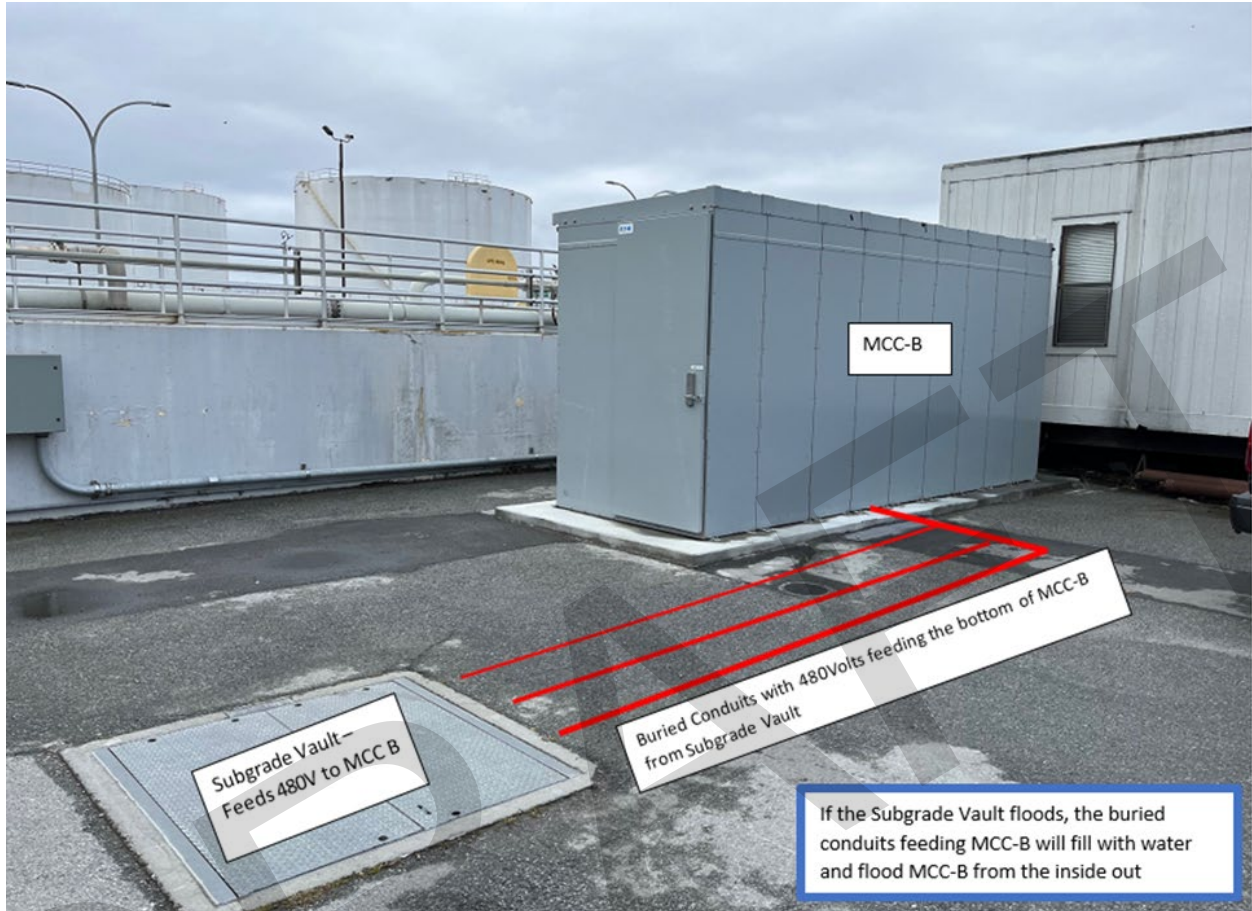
Photo of one of the eleven Motor Control Centers (MCC) at the SSF - SB WQCP, which each have buried conduits connecting through a subgrade vault. These conduits are vulnerable to flooding and could funnel water to the MCCs, which power various facilities throughout the plant.
